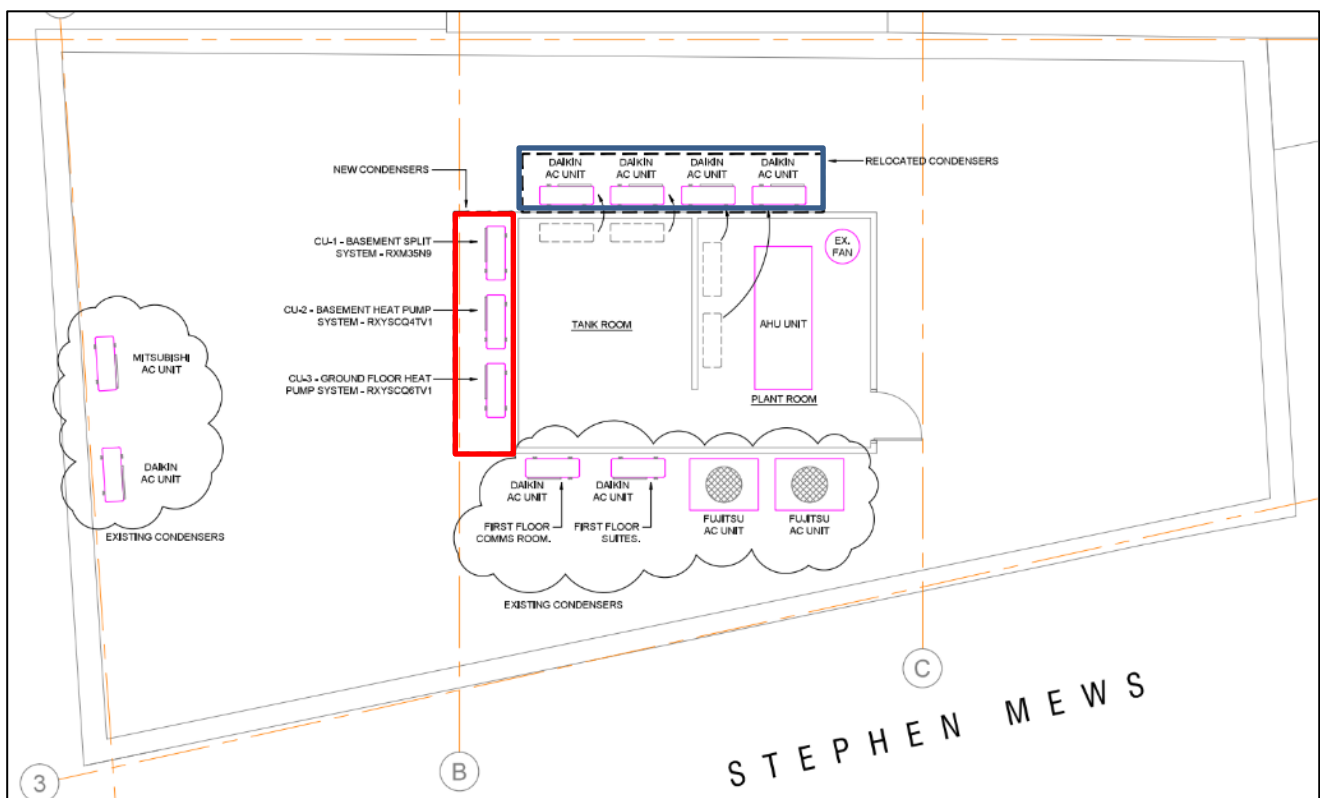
Position of relocated (blue) and new (red) mechanical plant on the roof of 10-11 Stephen Mews
